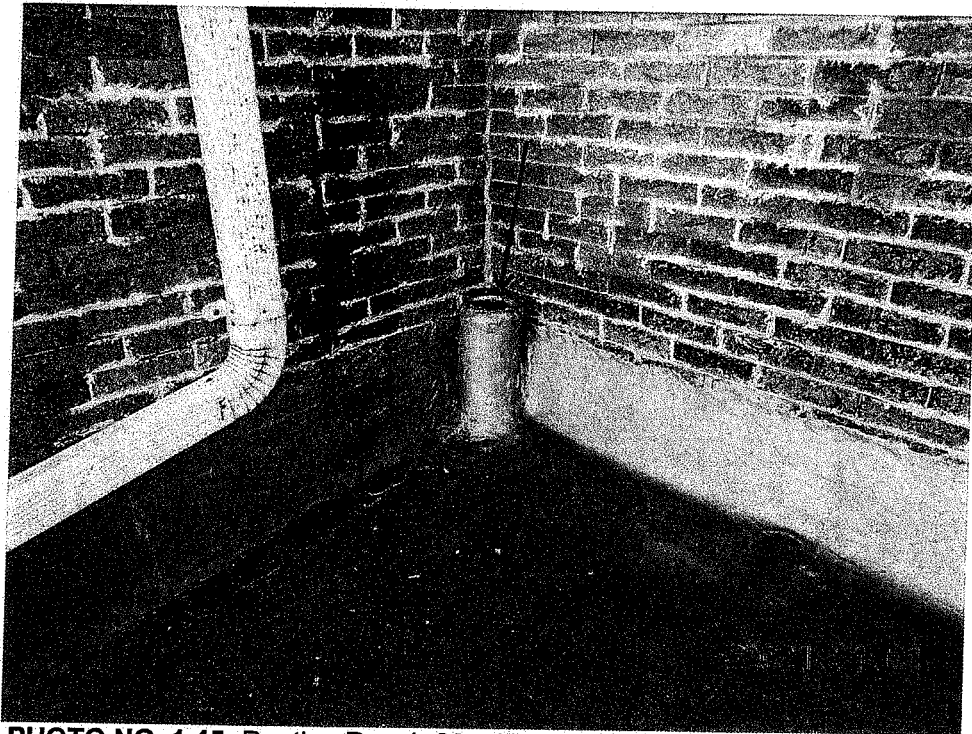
Routine Repair 20 – Unsealed penetration in roof – Roof, Grid B/5
